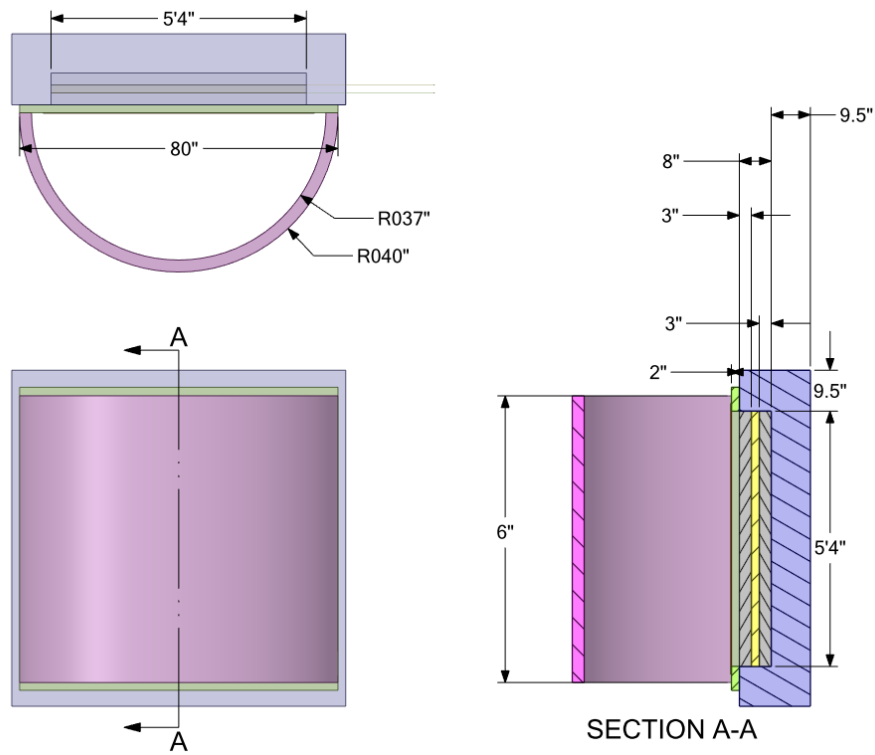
Formed concrete wall: Dimensions of heater and wall assembly.
